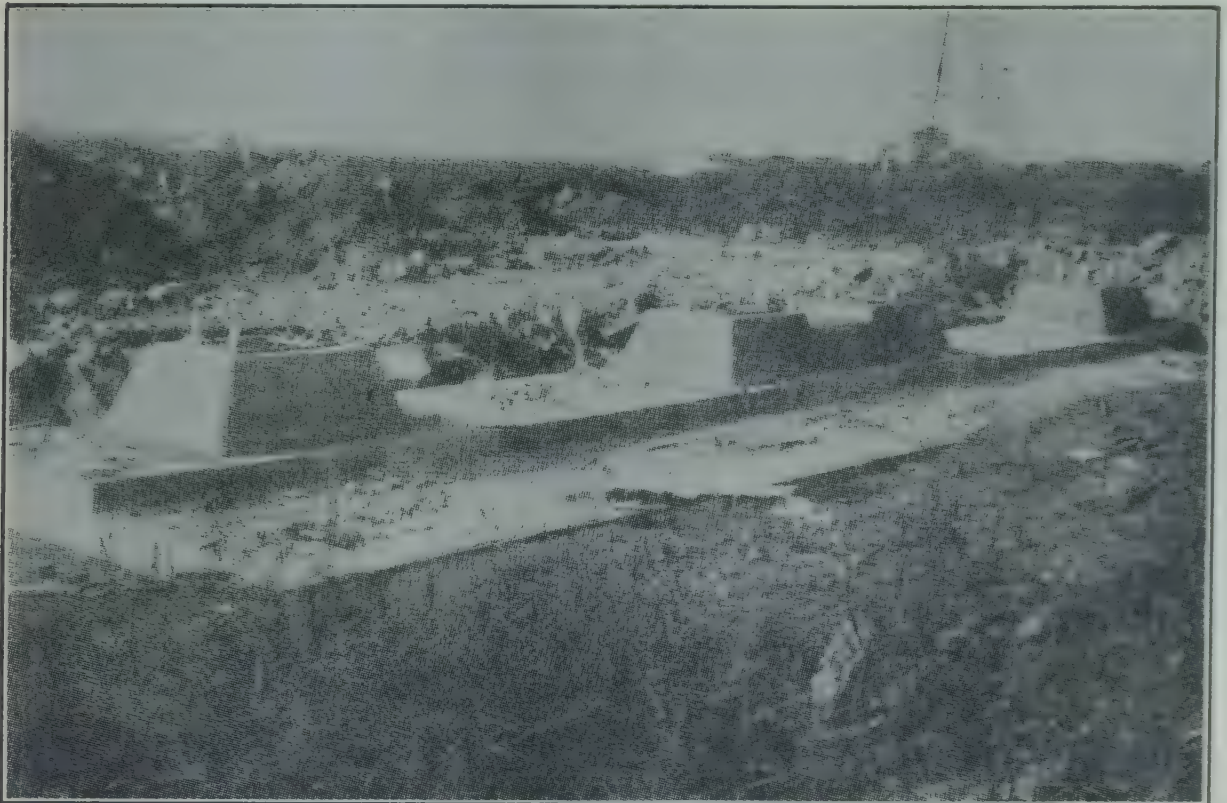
Foundation for six-lane viaduct, New Jersey approach to the Lincoln Tunnel, New York City.
